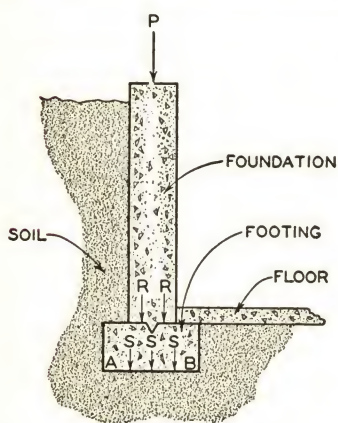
Foundation for Ordinary Building Such As a Residence or Barn Showing How Wall and Floor Loads Are Supported by the Foundation, How the Footing Supports the Foundation, and How the Soil Supports the Footing
